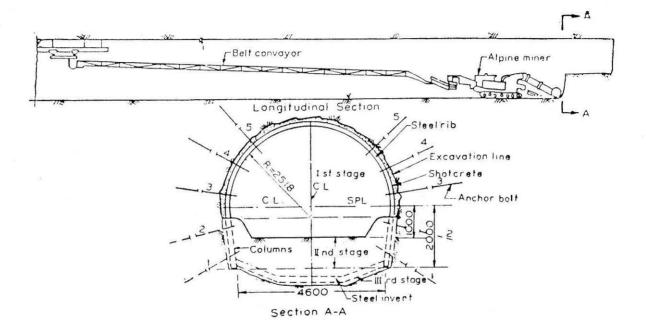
Typical Cross-section of Tunnel, Full Face Sequence (Loktak H.E. Project)
